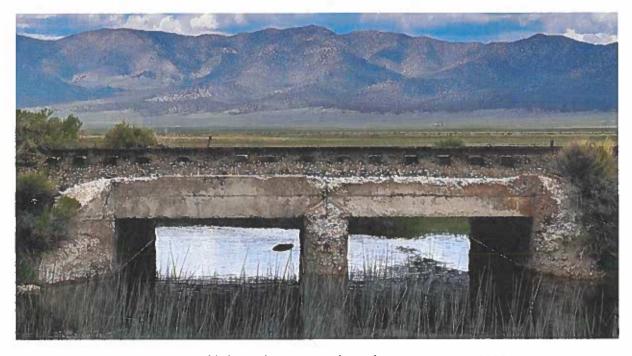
Double box culvert over Duck Creek, MP 114.4. June 2023
